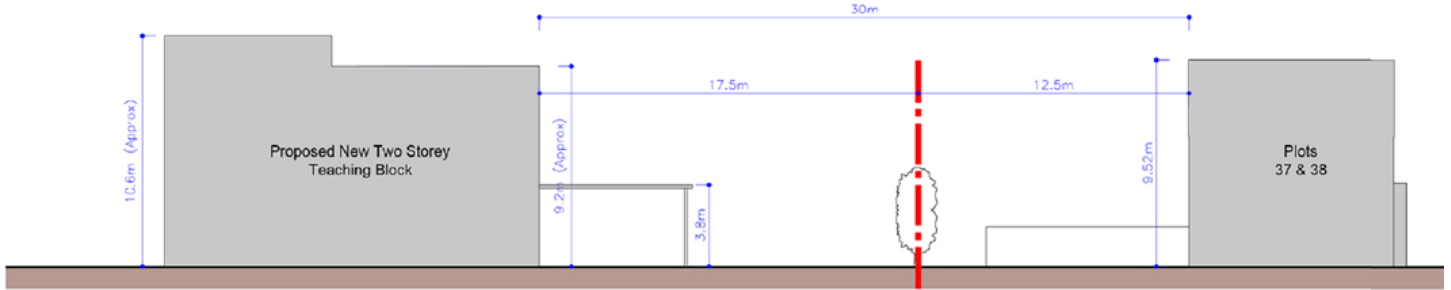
Cross section of School Proposals and Proposed Development of the Site
